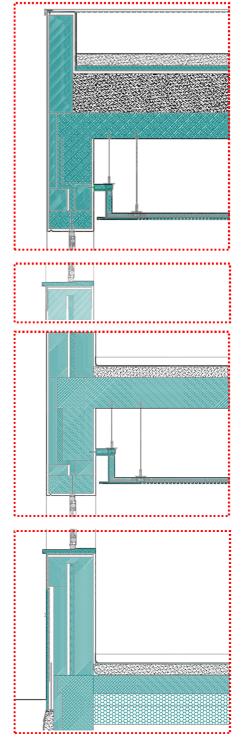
Escola Secundária de Montemor-o-Velho | Façade section (Central Building)
